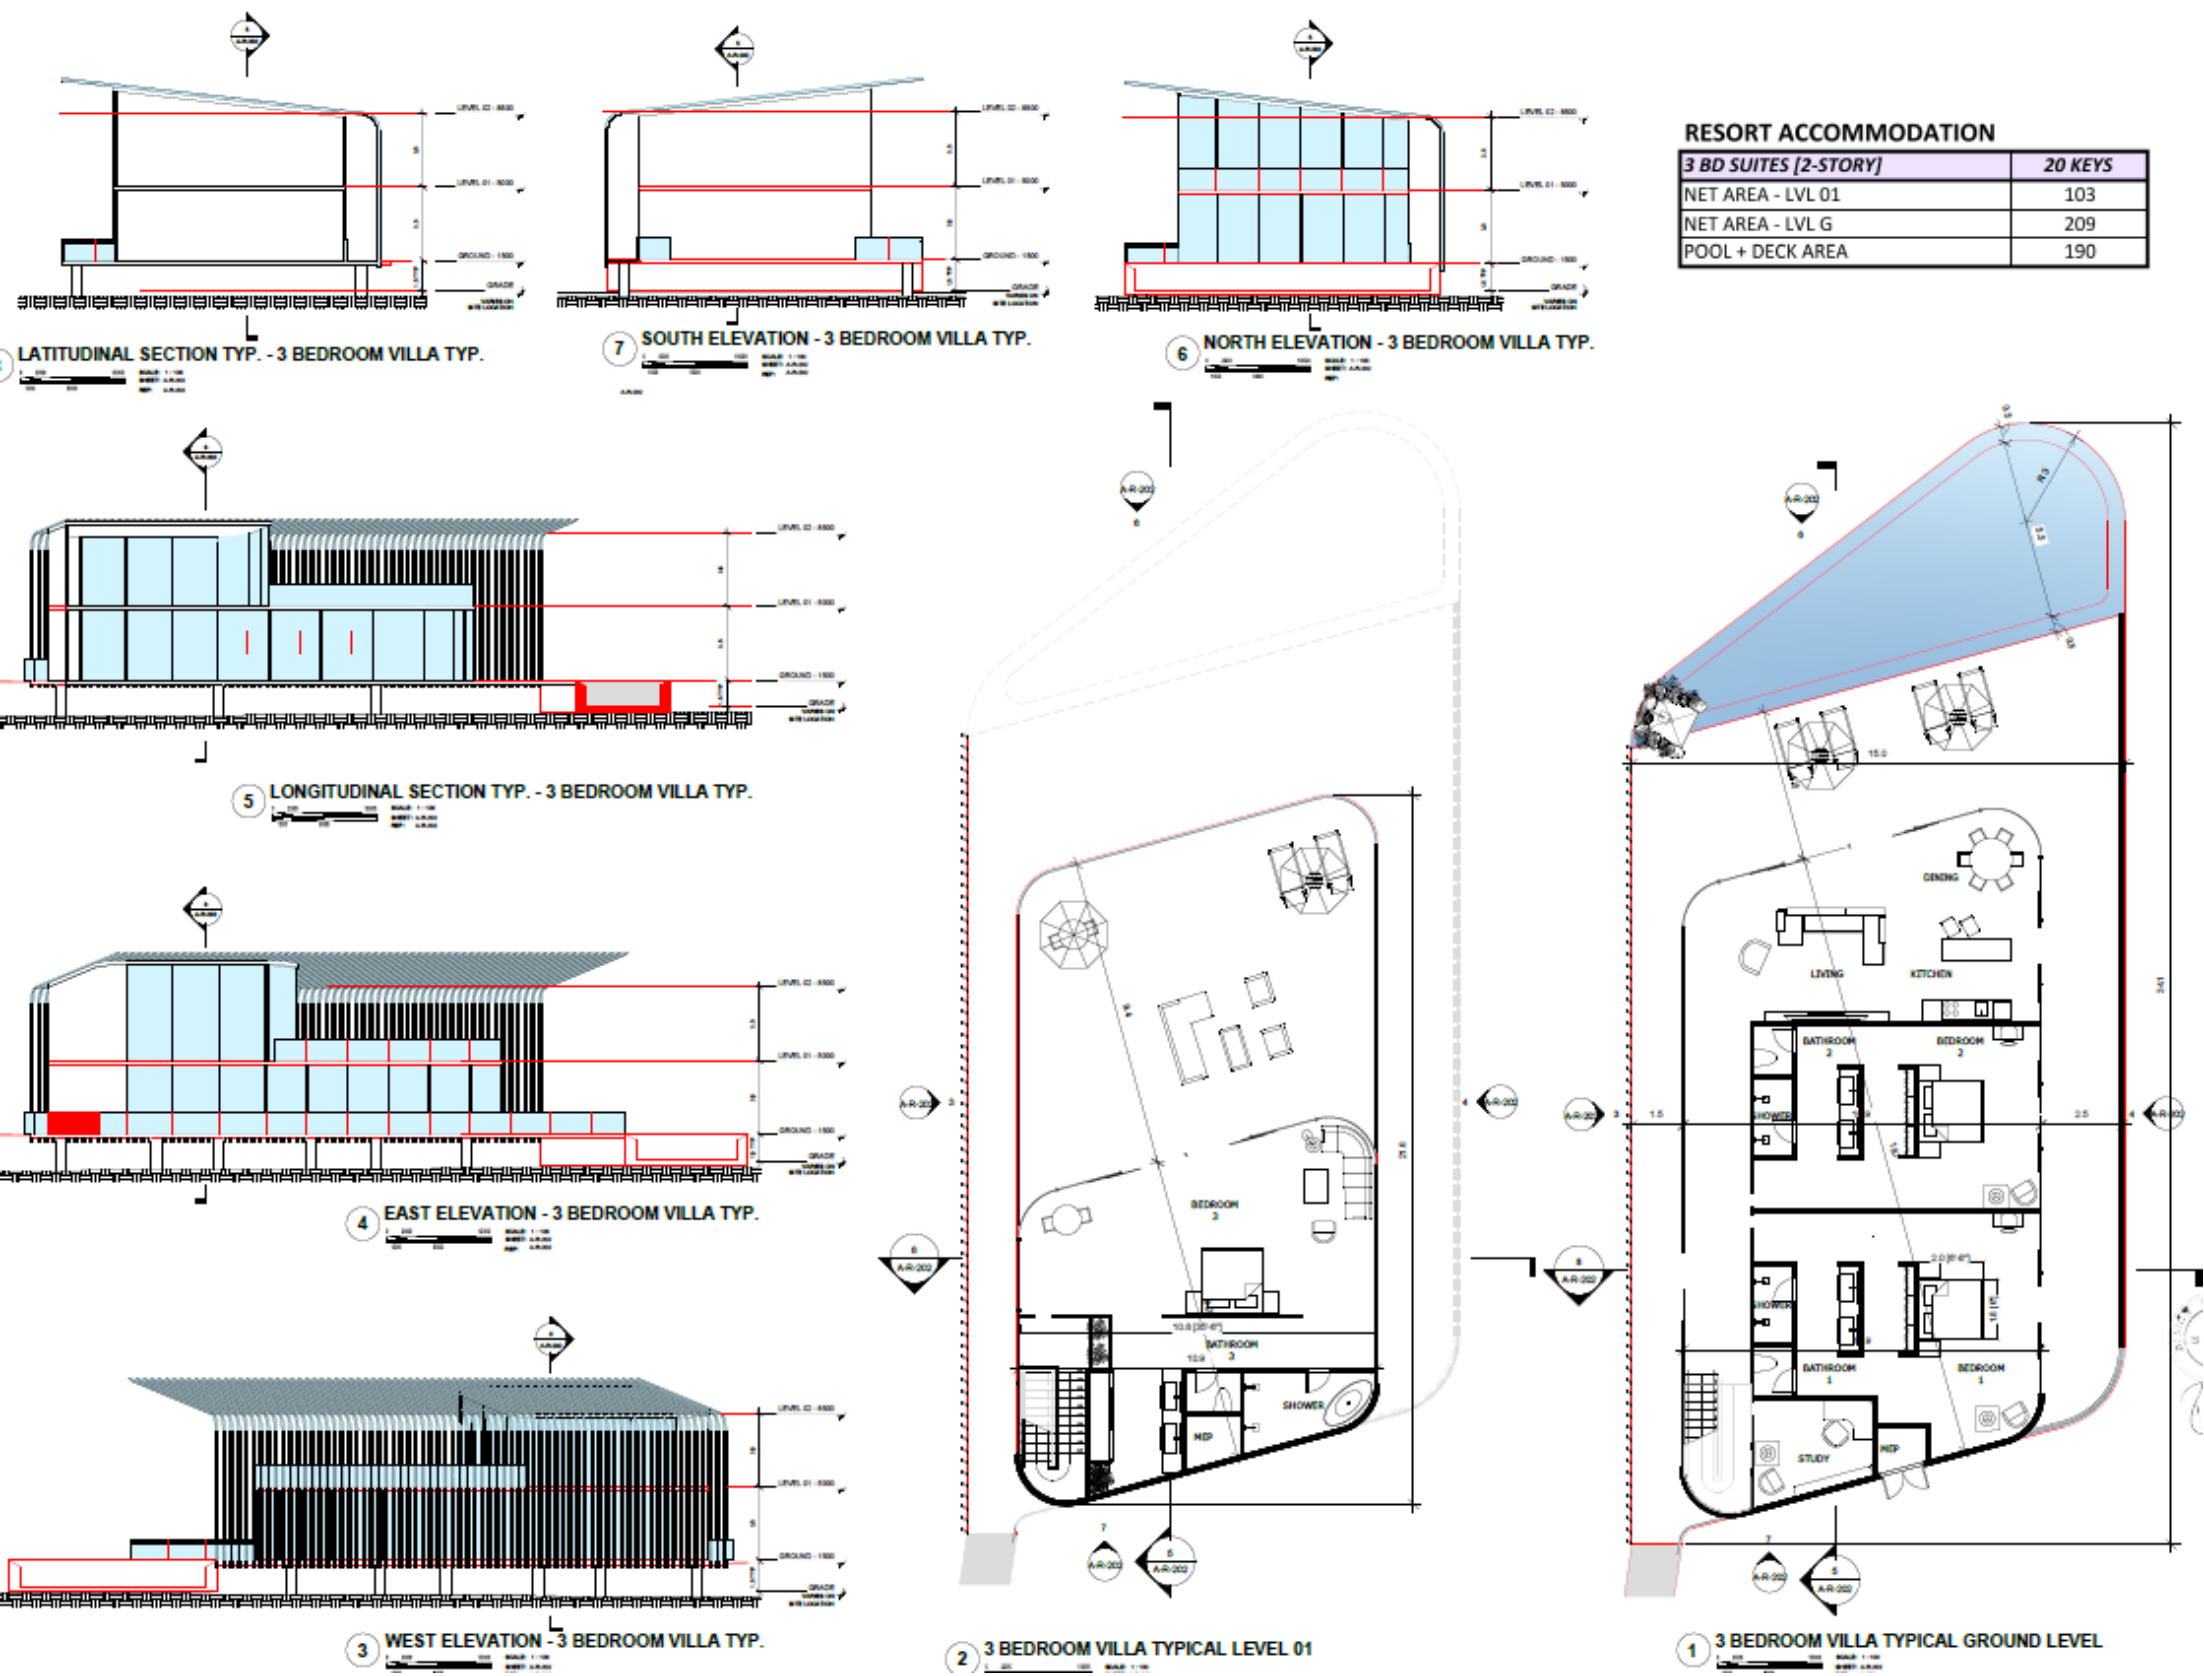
Resort 3-bedroom suite plans, elevation, and sections
